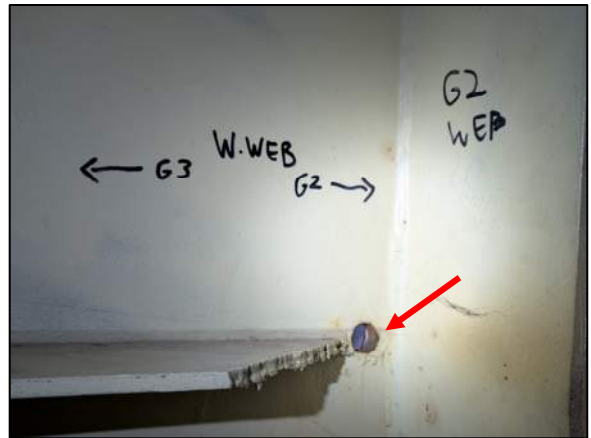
Missing expansion plug at the upper longitudinal stiffener retrofit at Girder 2
